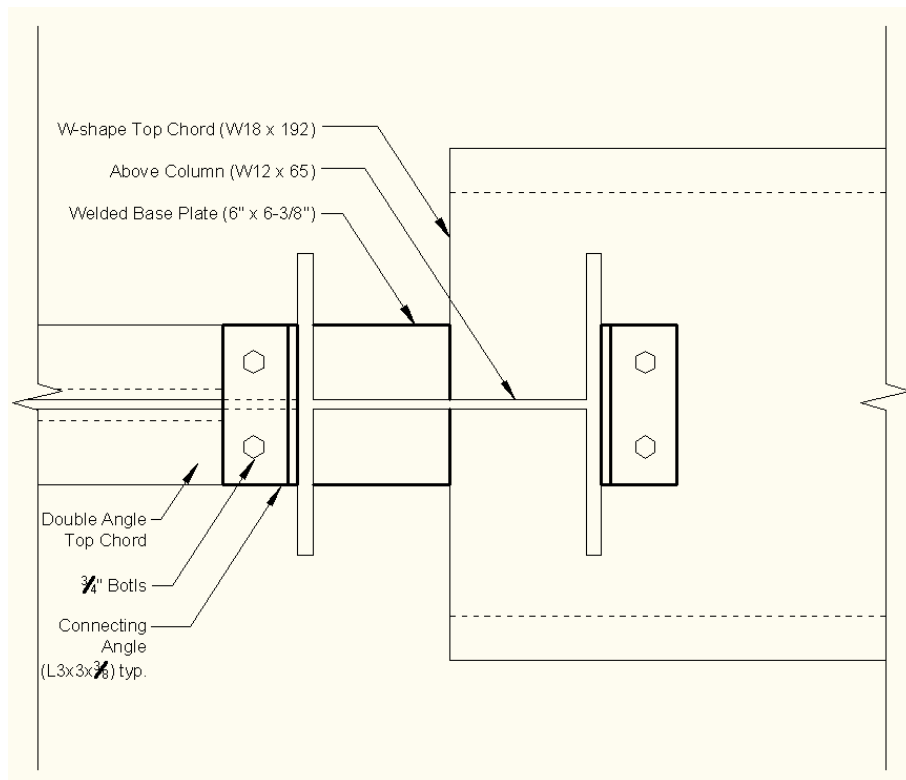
Alternative 3 Member A to Member B with Above Column Plan View
